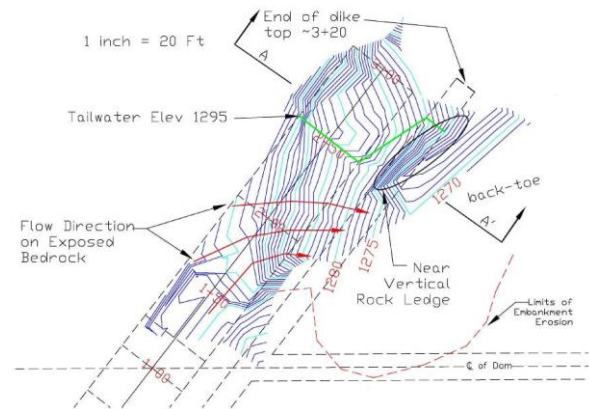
Sugar Creek L-44 Plan of Erosion Damage
